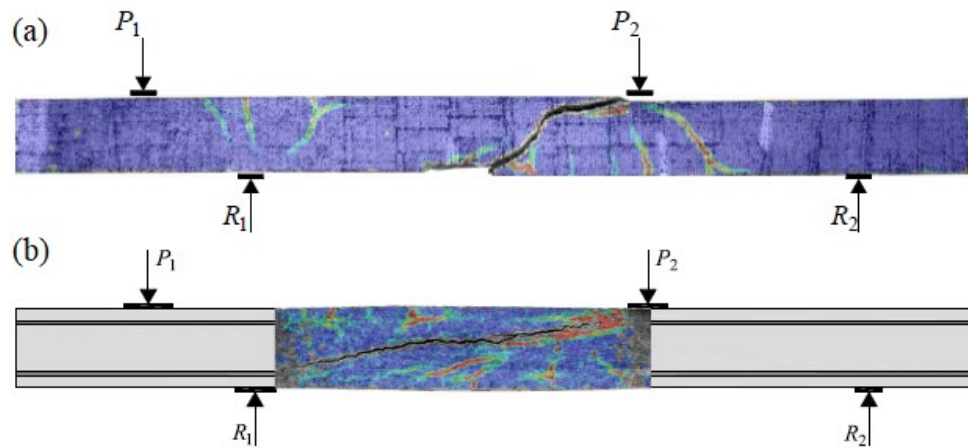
Crack pattern at failure for a continuous beam without ASR damage (a) or with ASR damage (b) (Hansen, 2019)
